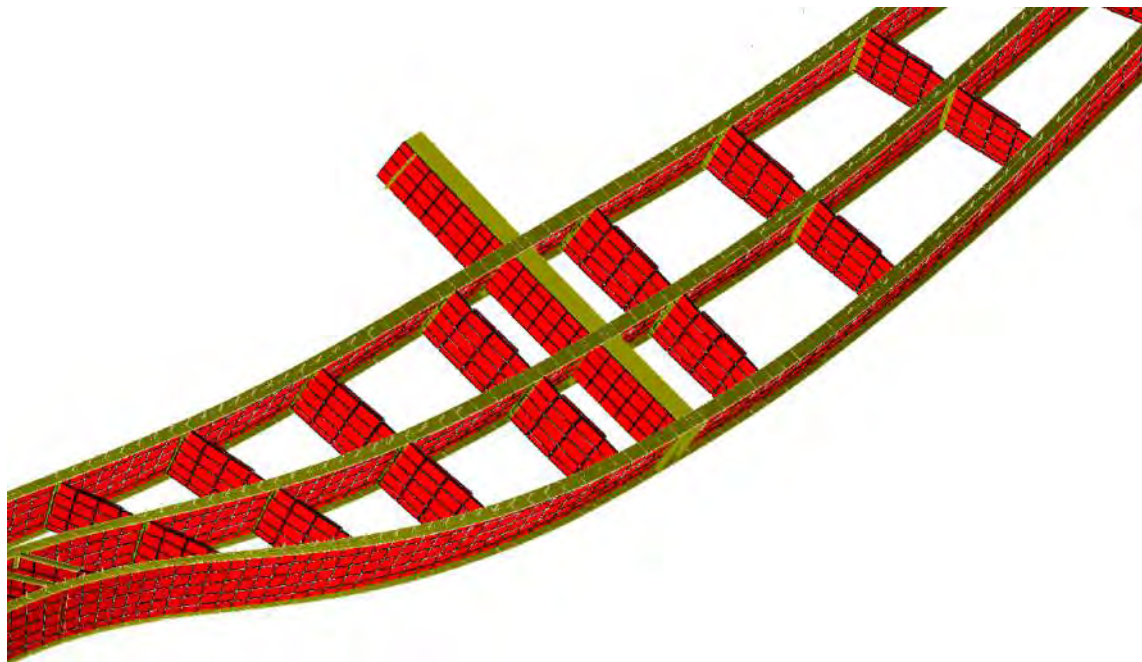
Deflected Shape at Straddle Bent Following Fracture Near Exterior Girder (Deck not shown for clarity)
